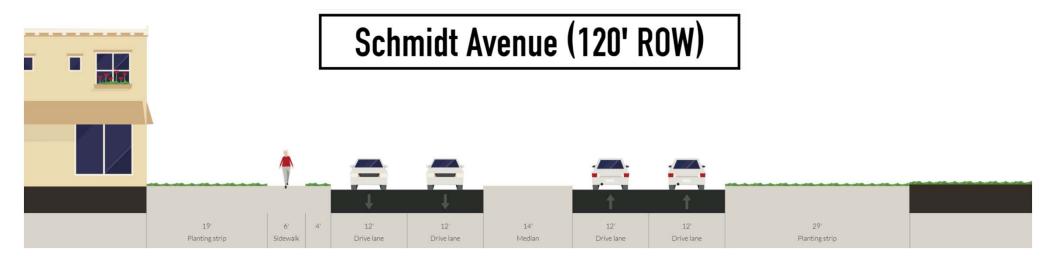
Existing roadway sections with minimum 50' and maximum 120' right-of-way.
